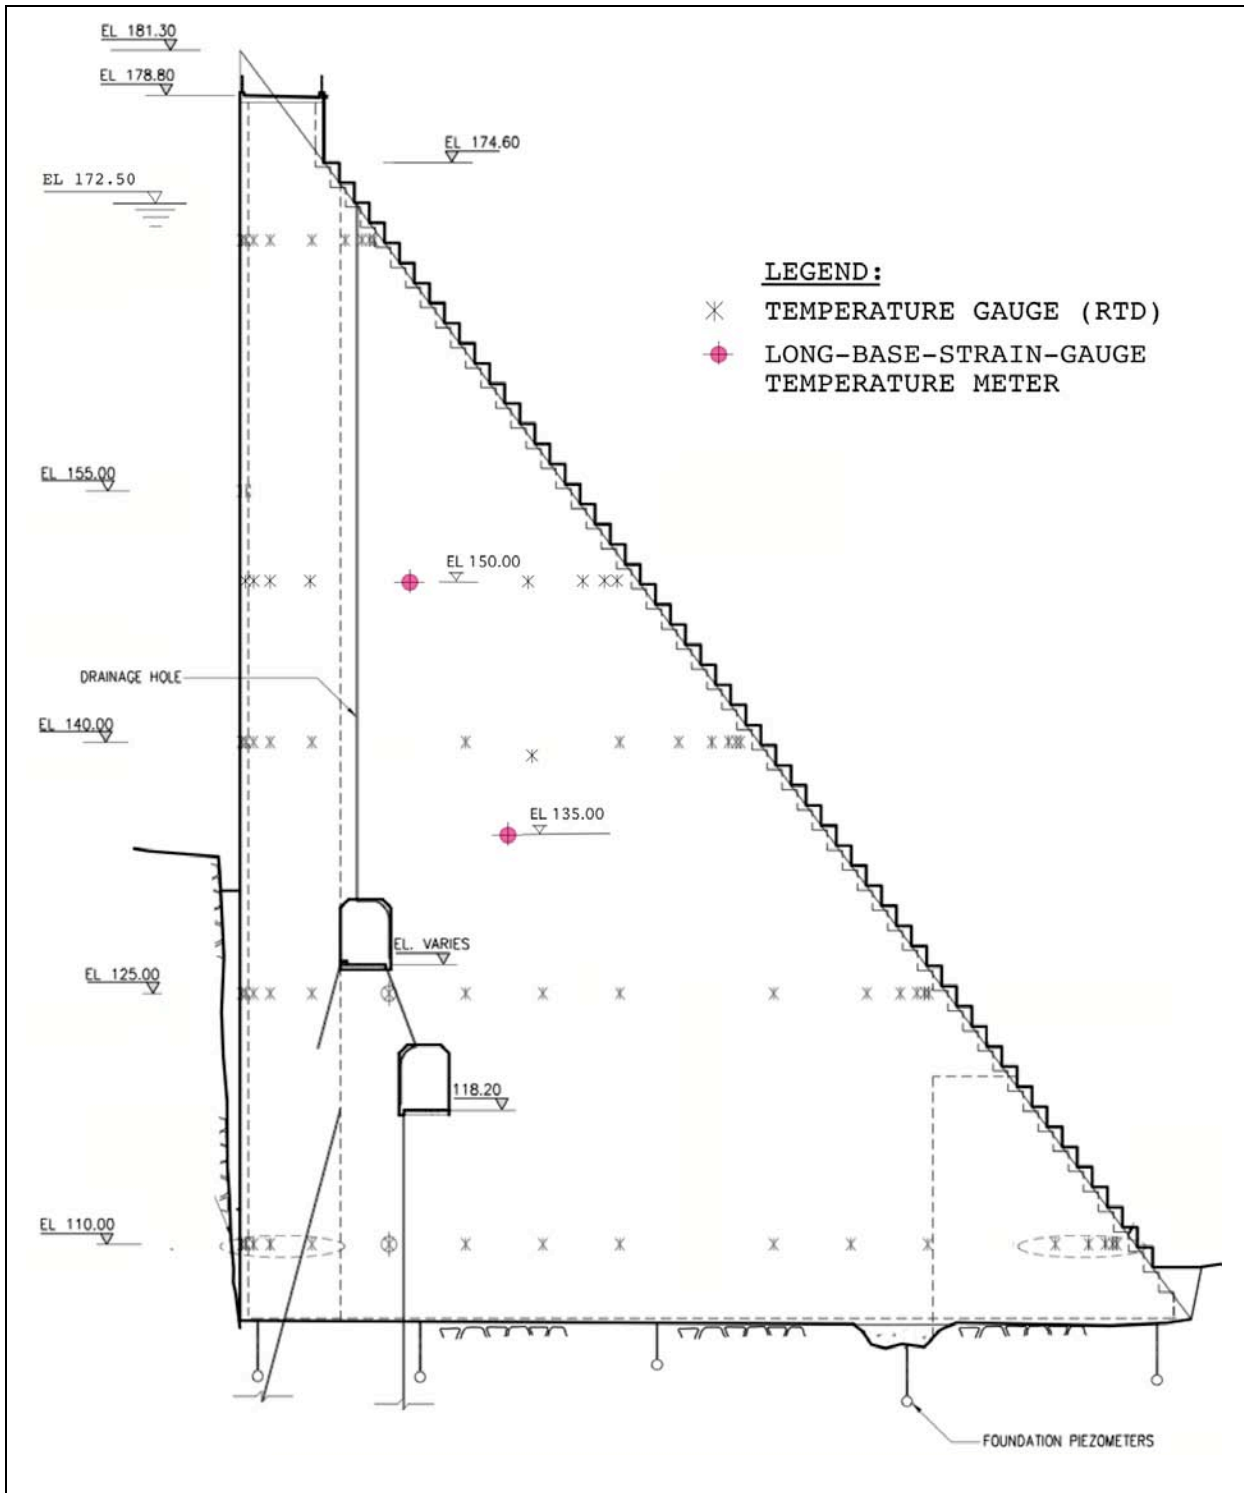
Typical Instrumentation - NOC Section – Wadi Dayqah Dam^(1,3)
